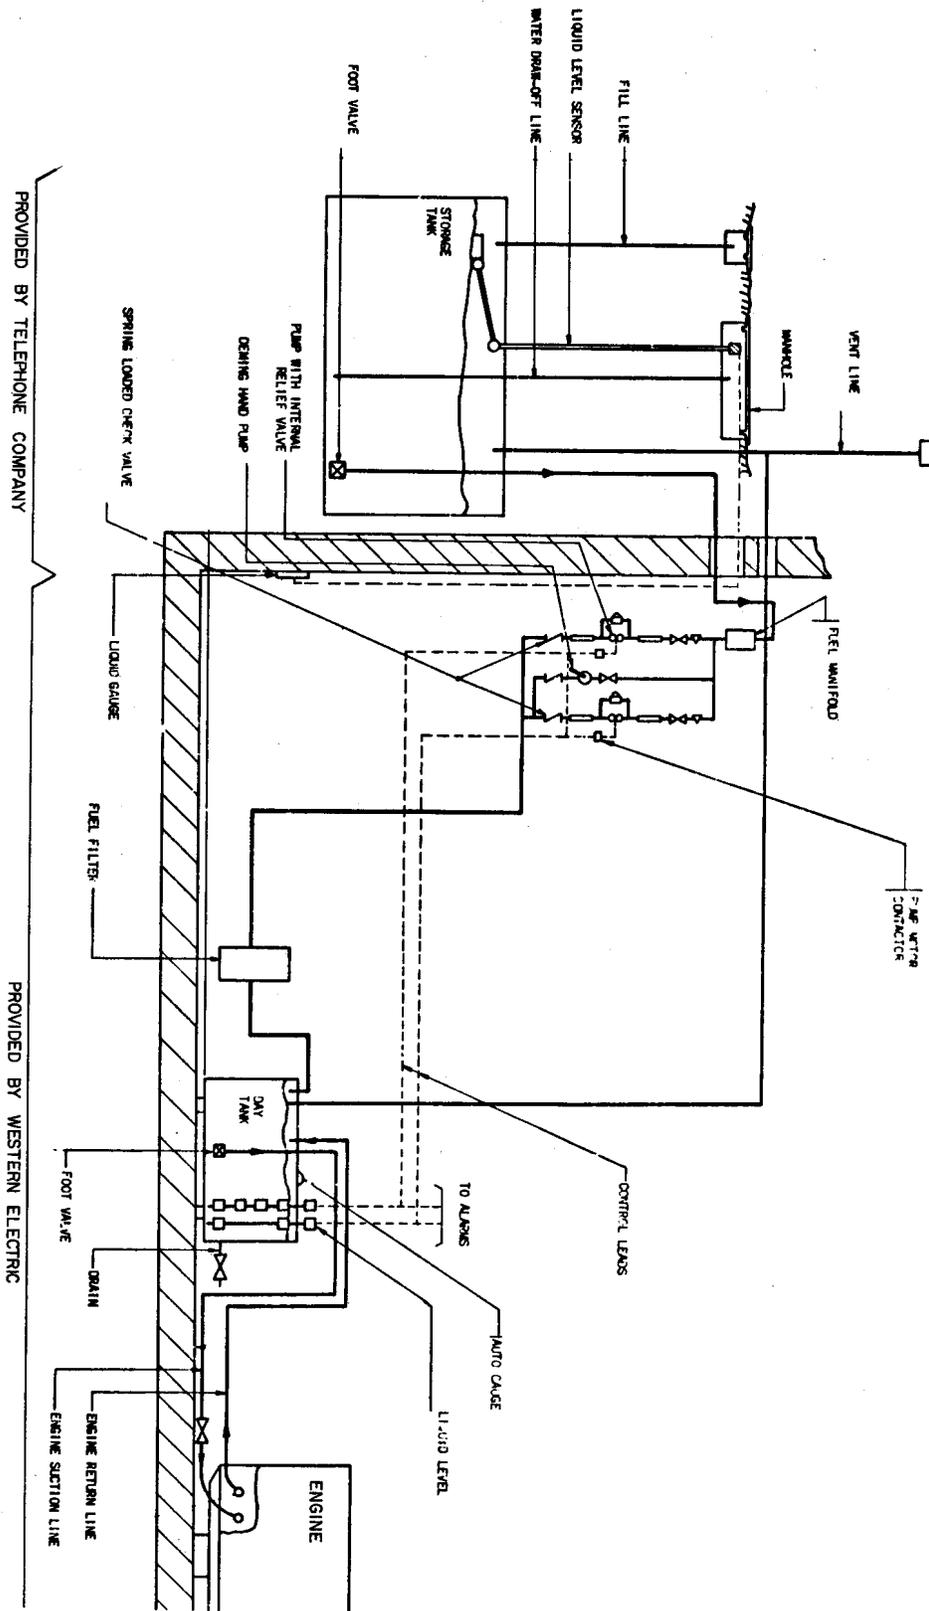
Typical Fuel Equipment Arrangement Utilizing Buried Storage Tank
